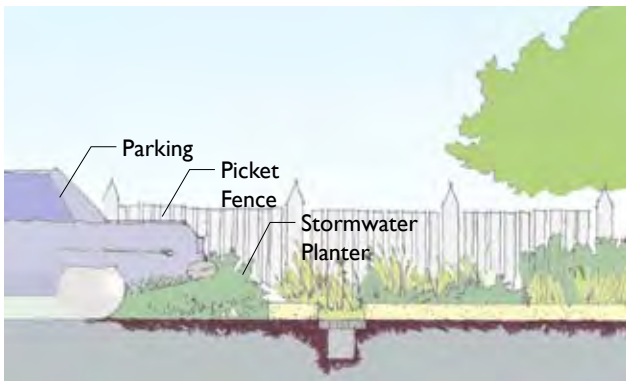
Parking, Stormwater Planter, and Residential Picket Fence
